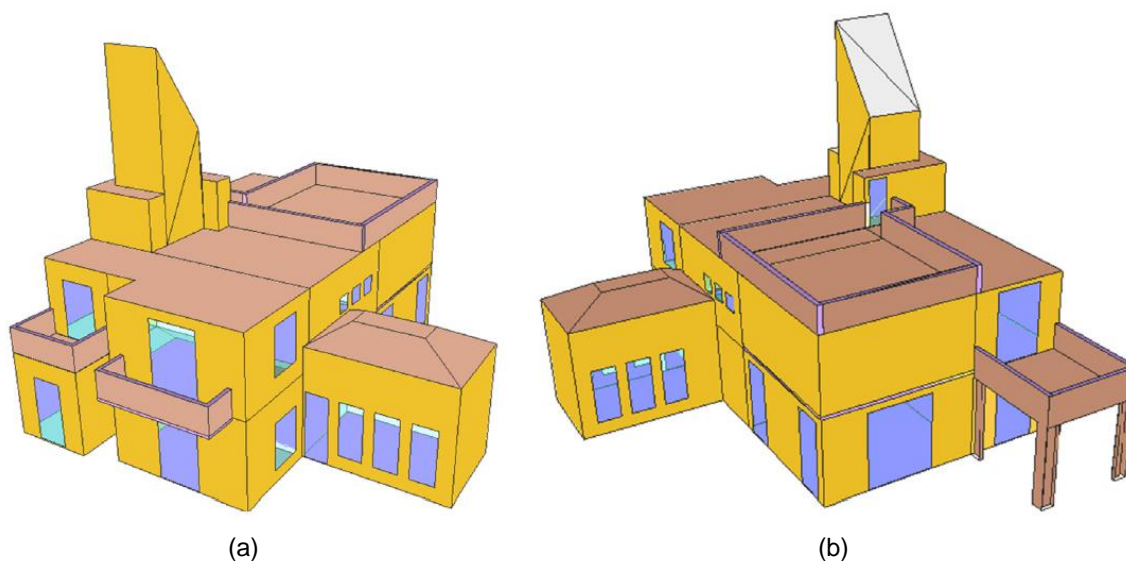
3D architectural sketches of the studied house: (a) North-East sight, (b) South-East sight [2]
